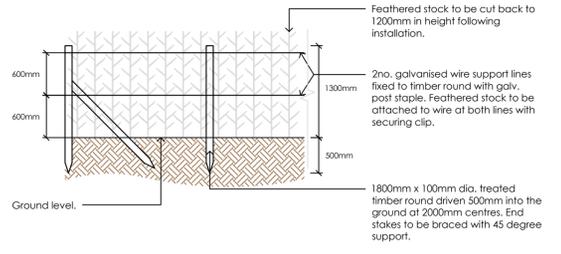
Typical Native Hedgerow Double Staggered Layout (N.T.S.)
